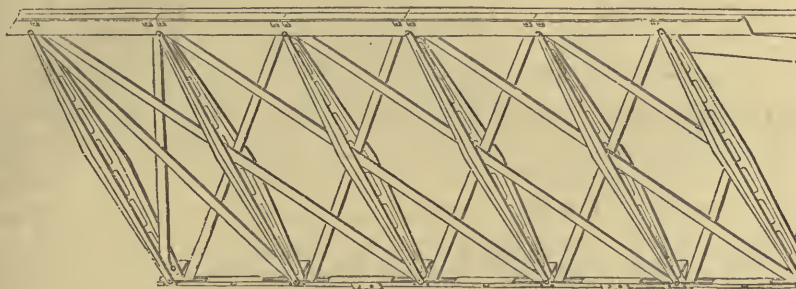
represents the elevation, fig. 631 the plan, and figs. 632, 3 and 4, the details of framing. This bridge consists of two iron trusses of 50 feet span, and 9 feet high. What would be called the upper chord consists of cast-iron pipe, 6 inches in diameter, and $\frac{1}{2}$ inch thick, equal to 9 square inches—cast-iron uprights of + section, and 8 feet 4 inches apart from centre to centre, connect the upper chord on which the track rests, with the bottom or tie. This latter is of $1\frac{1}{4}$ round iron, in loops, two of which, side by side, constitute the tie between each pair of uprights. These loops pass over shoulders at the foot of the uprights, through which shoulders pass the diagonal $1\frac{1}{4}$ inch wrought-iron rods, secured and adjustable by nuts. The dimensions of all parts of this bridge are proportioned to the strains they are to receive, and were calculated to withstand a rolling weight of 2,000 lbs. per running foot.
